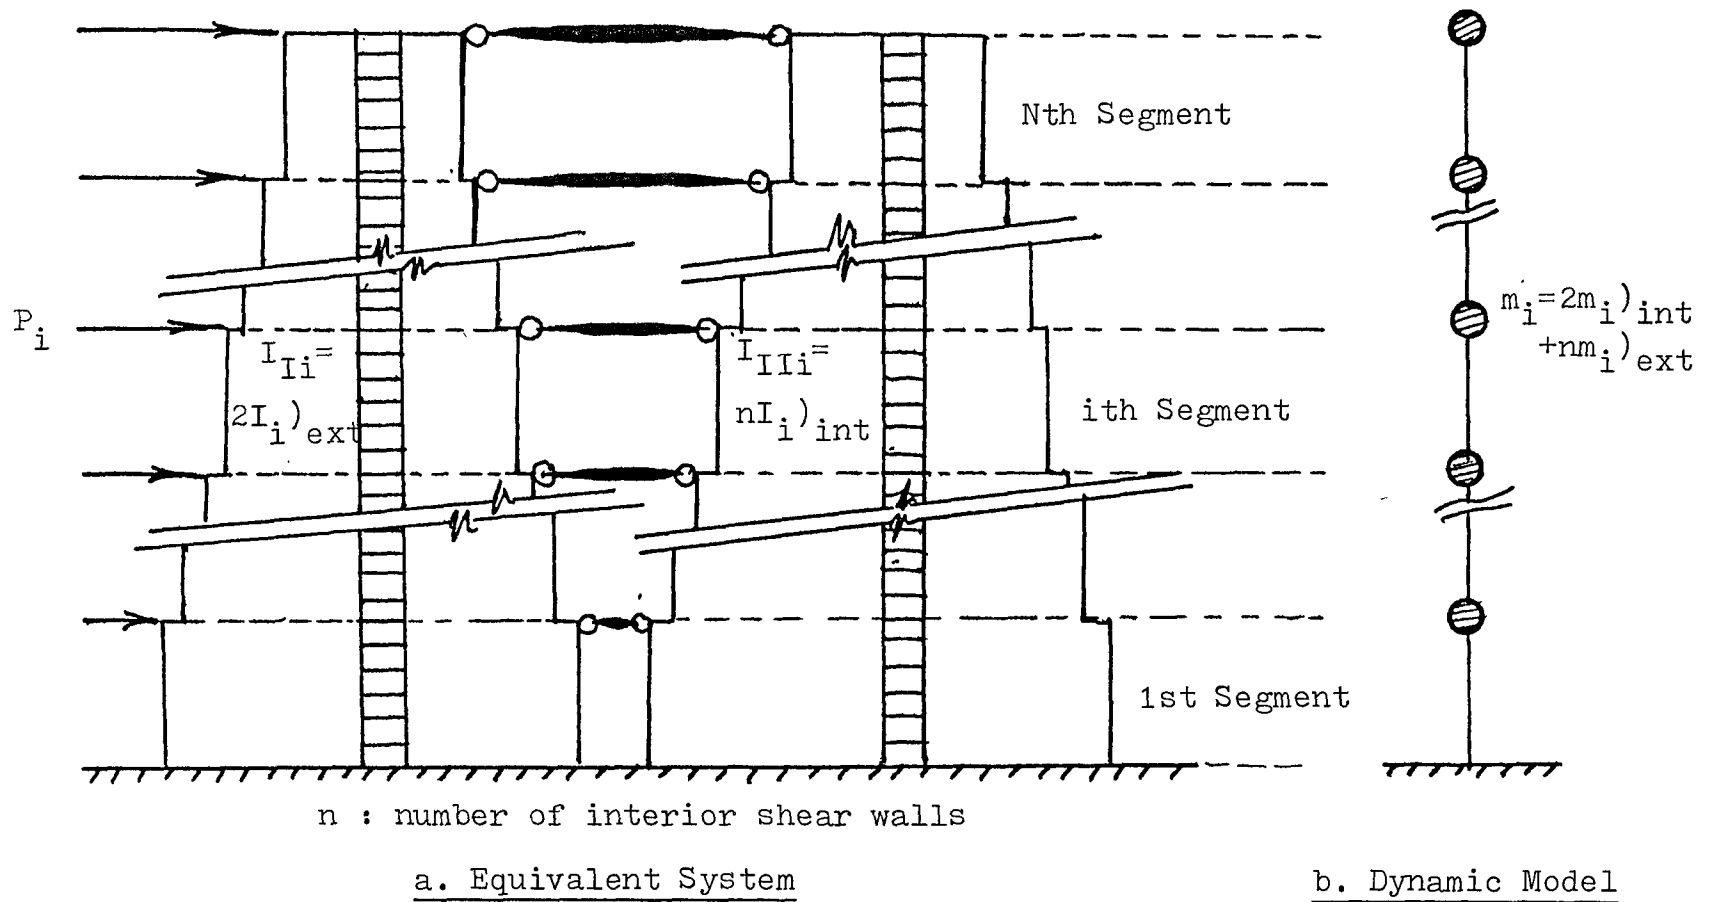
MODELLING OF TWO INTERCONNECTED COUPLED SHEAR WALL SYSTEM
